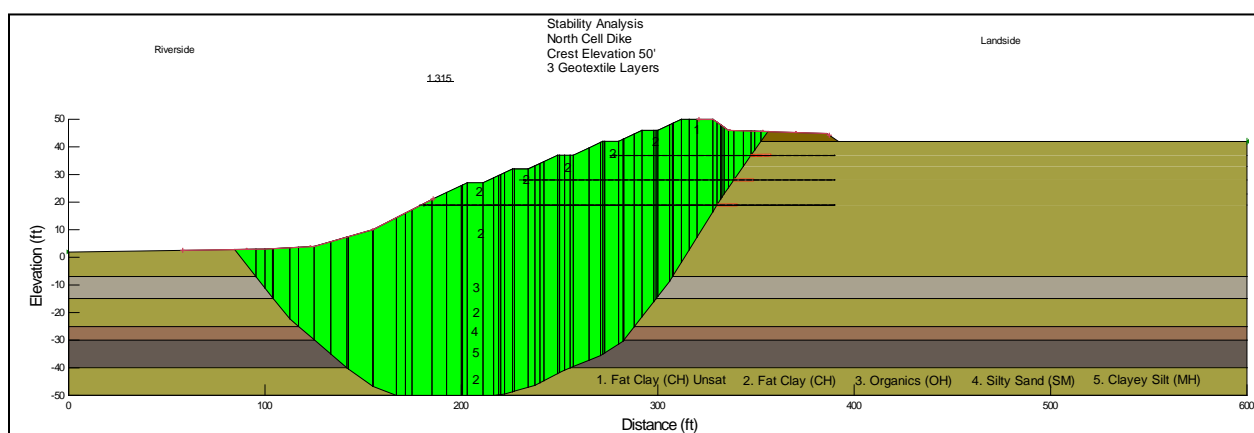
North Cell. Elevation 50'. 3 Geotextile layers. FS = 1.315
